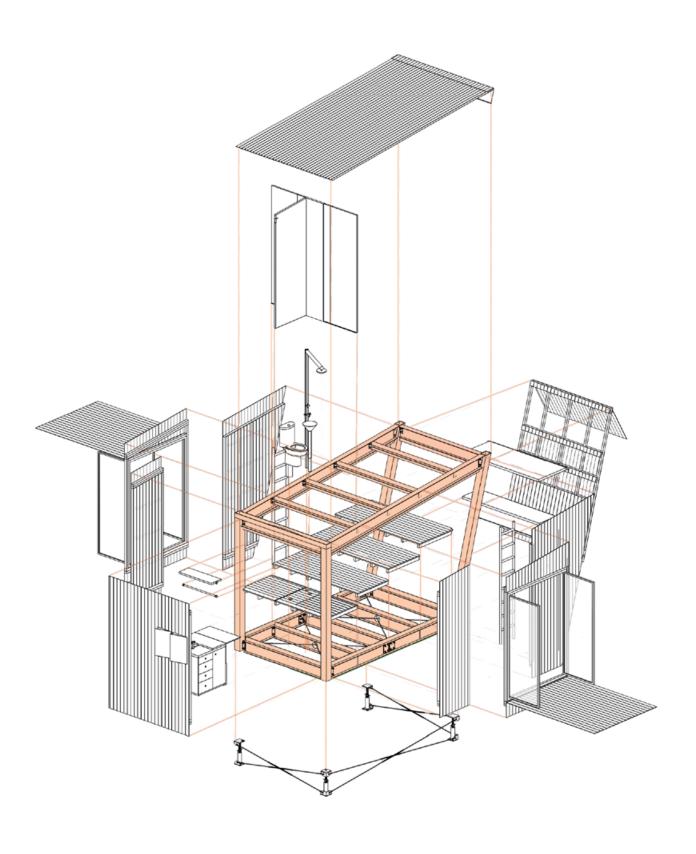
25. Exploded perspective view of design, showing primary structure with cladding sections, components and foundations.
